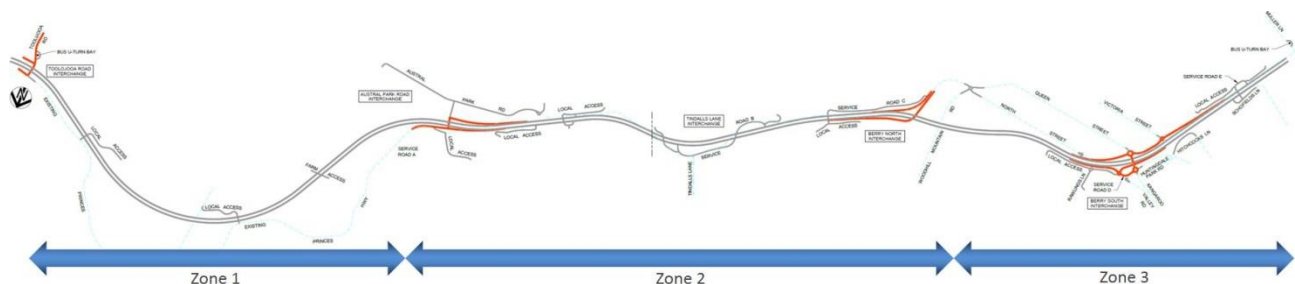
Construction zones – for Illustration purposes only, refer to construction staging design package for details
